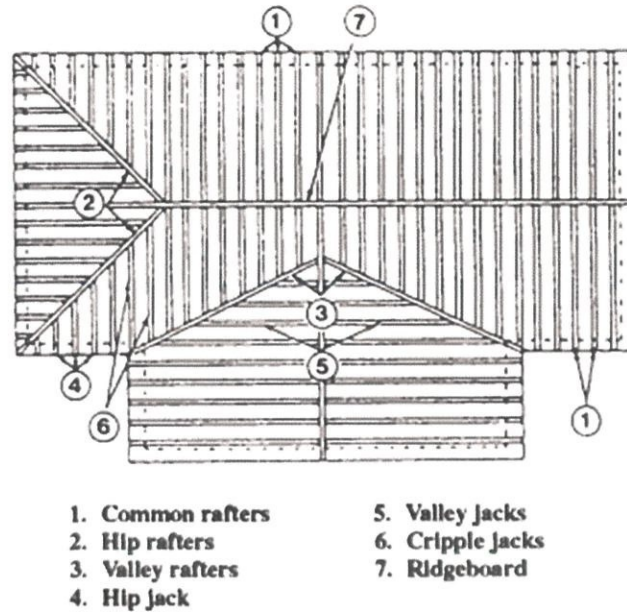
Type of Rafters for Pitched Roof
